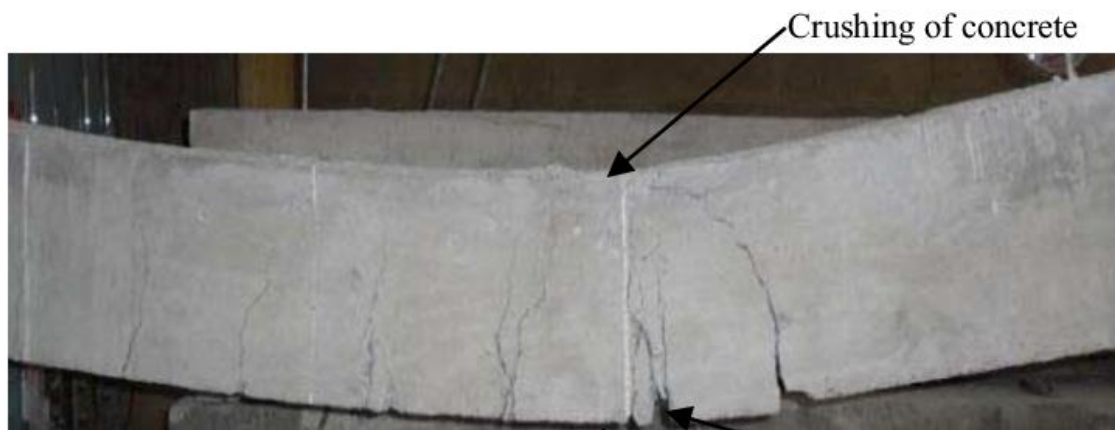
Typical flexural failure modes of GFRP-reinforced concrete beams
